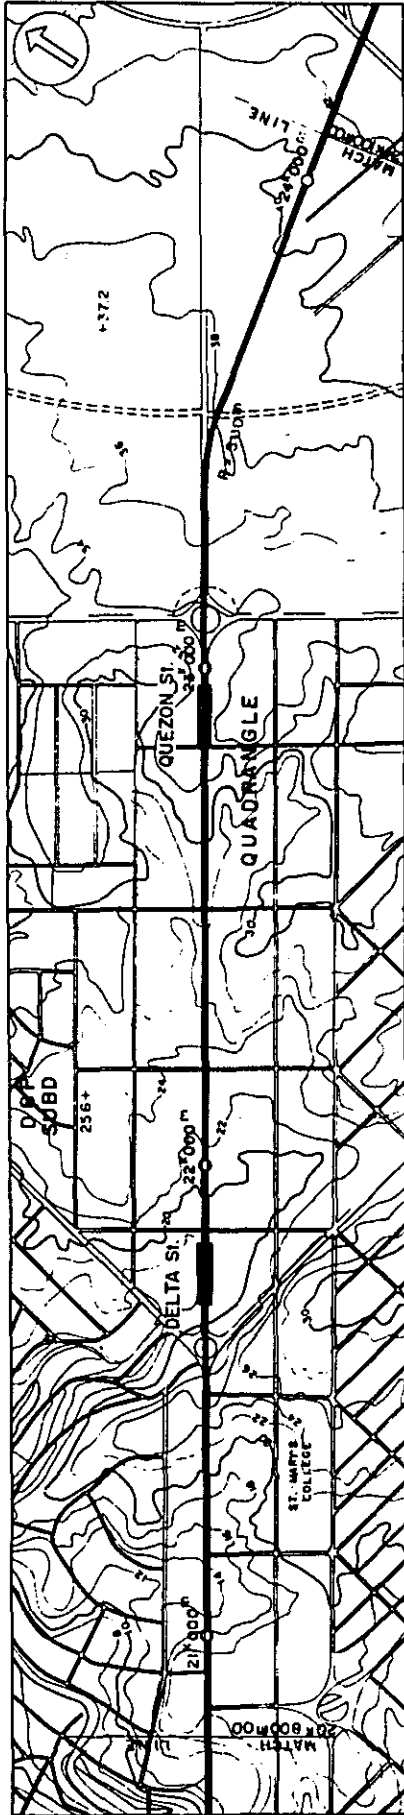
Plan and Profile of Recommended Alternative (7)
